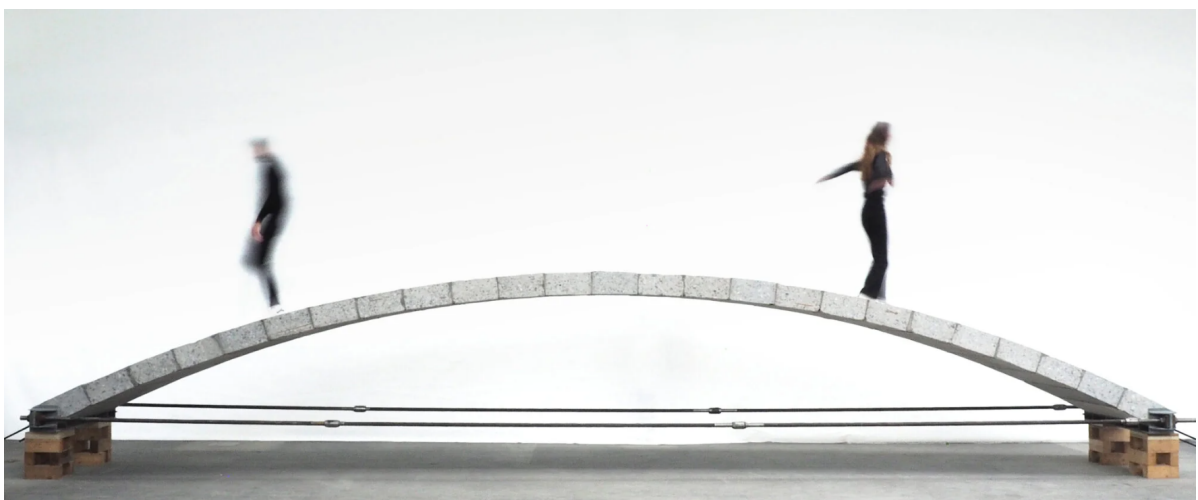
Re:Crete footbridge made of reclaimed concrete [28]
